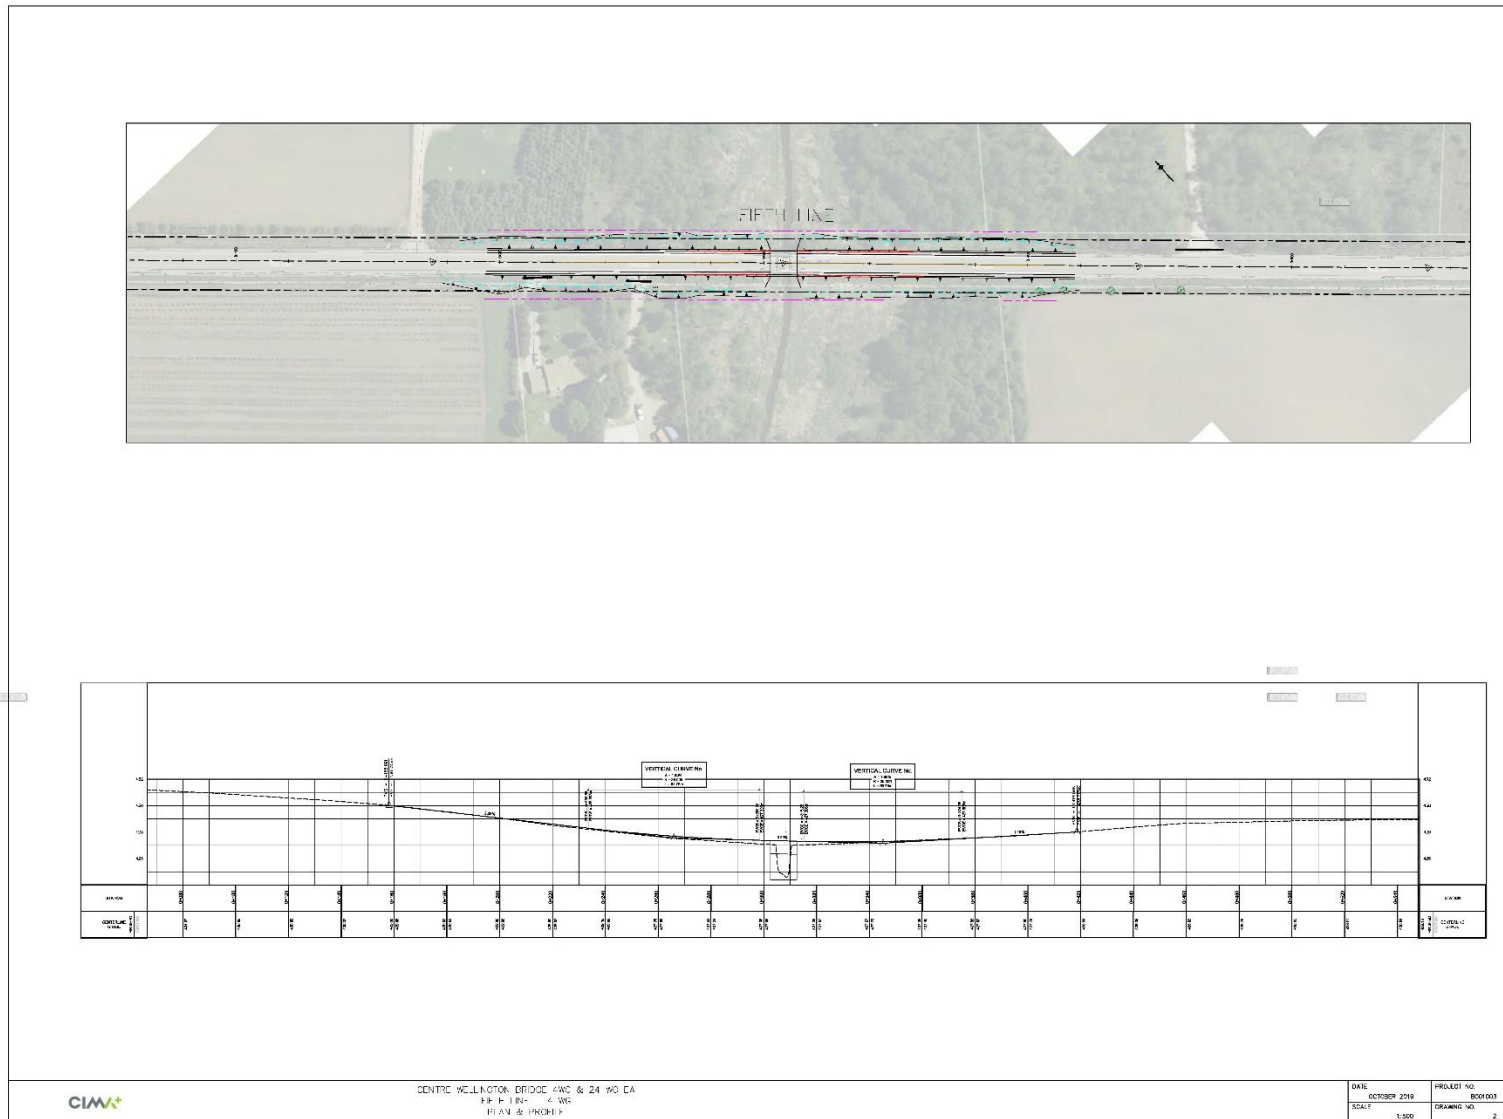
Centre Wellington Fifth Line Bridge 4-WG Plan and Profile (CIMA Canada Inc. 2019)
